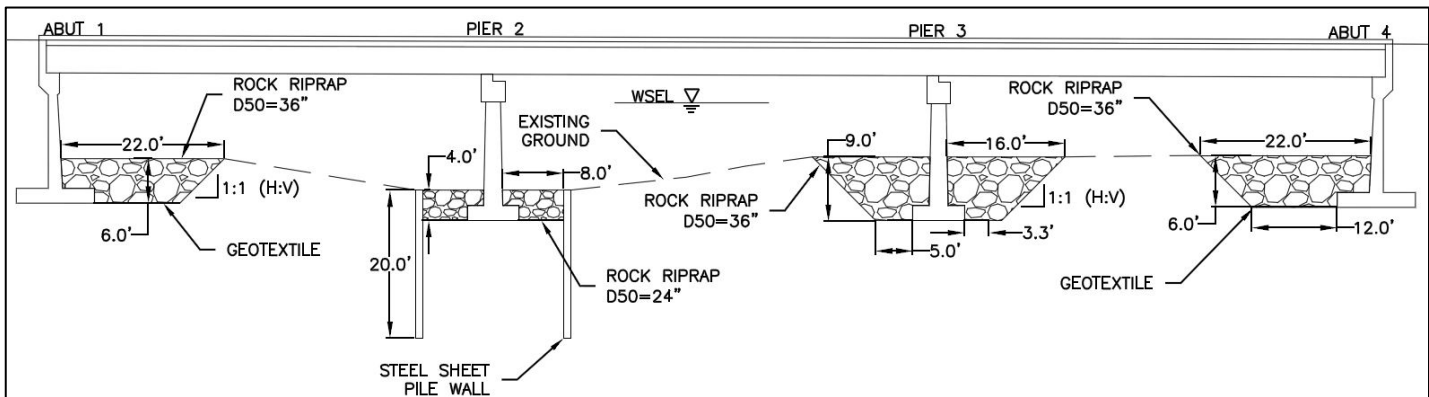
Cross-sectional view of Bridge D-03-A with designed hydraulic scour countermeasures
